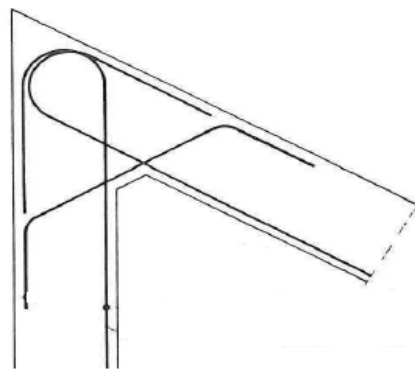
Reinforcement detail for obtuse corner joints and their crack patterns (Nilsson, 1973)
